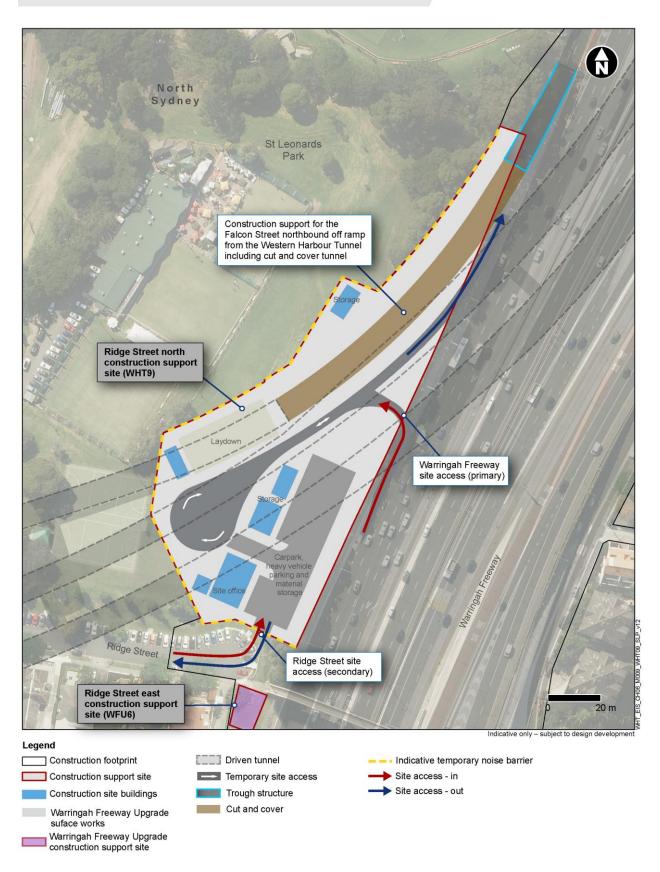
Indicative construction support site layout – WHT9 – Ridge Street north
